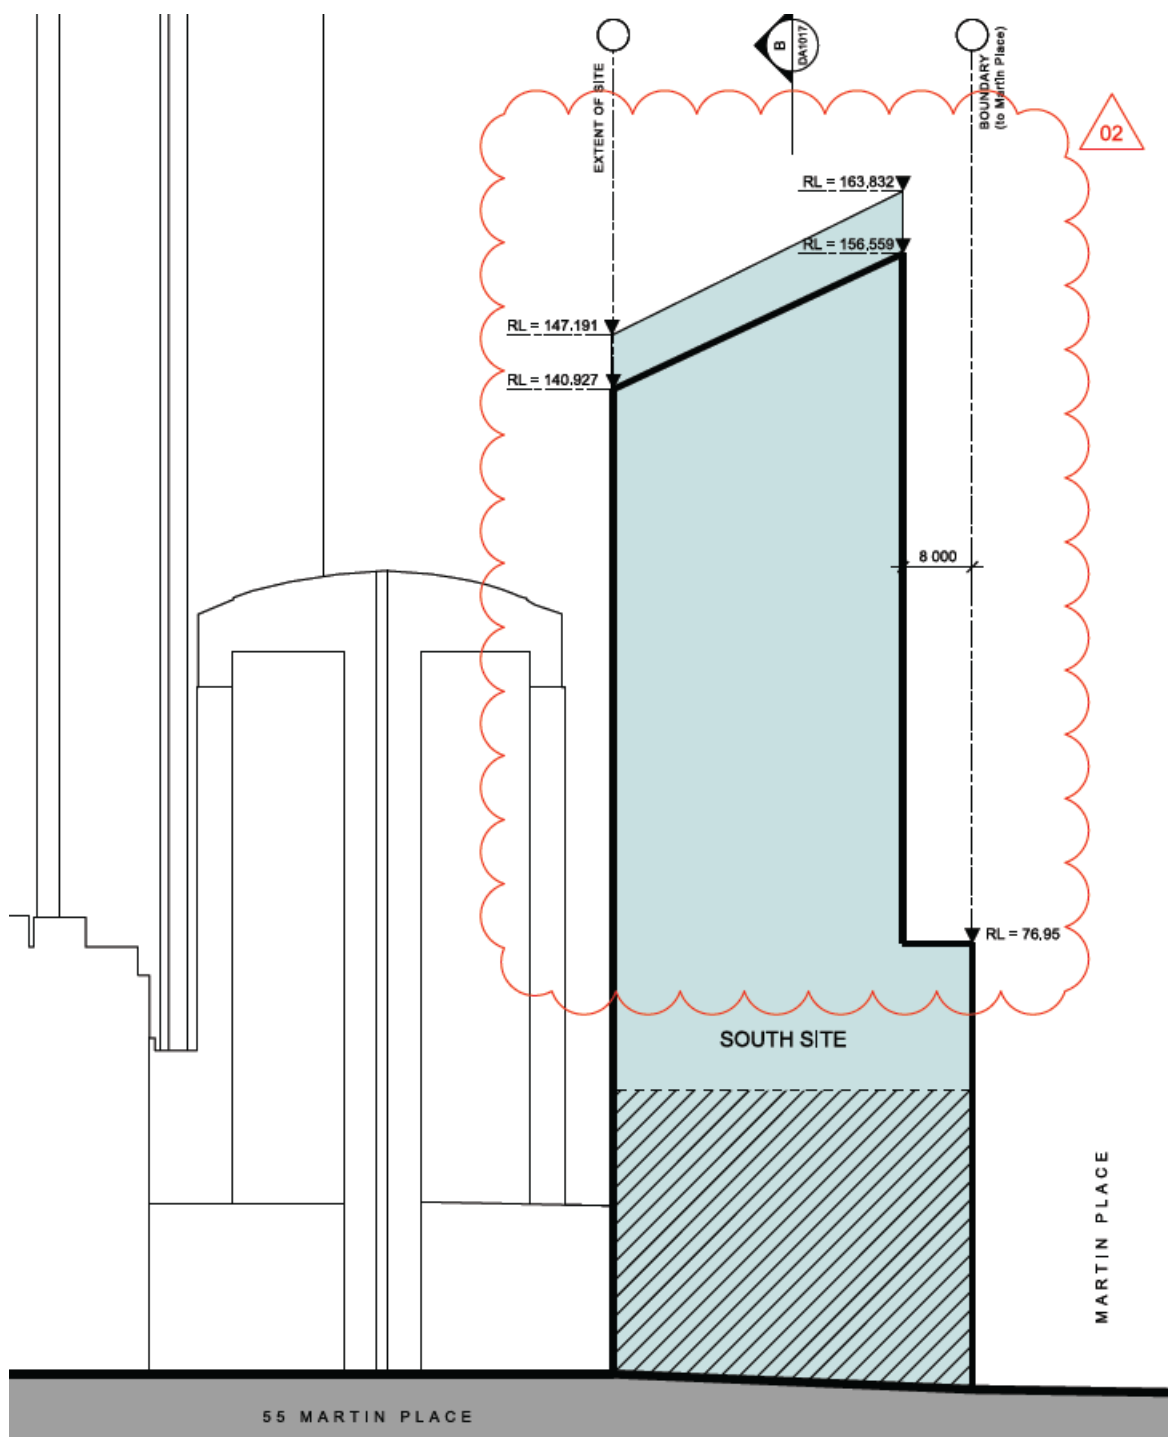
Proposed South OSD tower building envelope, east elevation (amendment clouded red)
